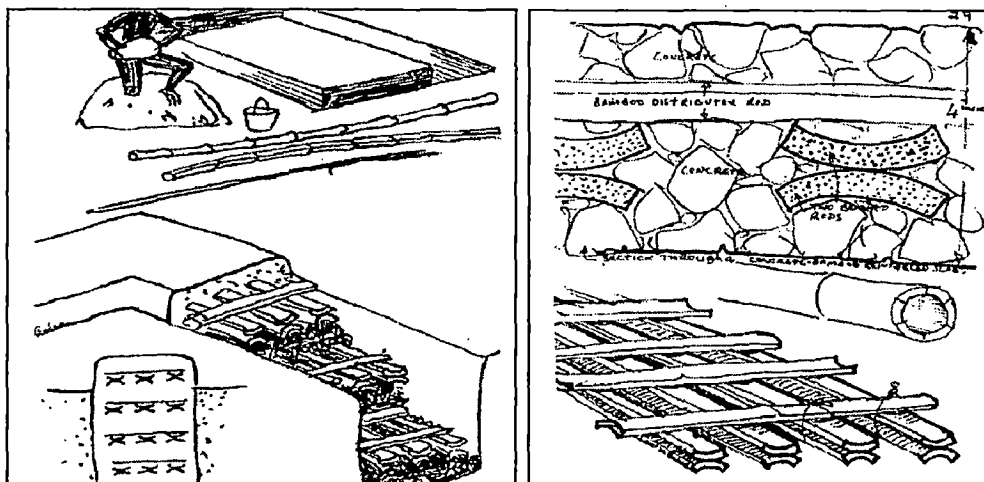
Use of bamboo as reinforcement in foundation and roof
